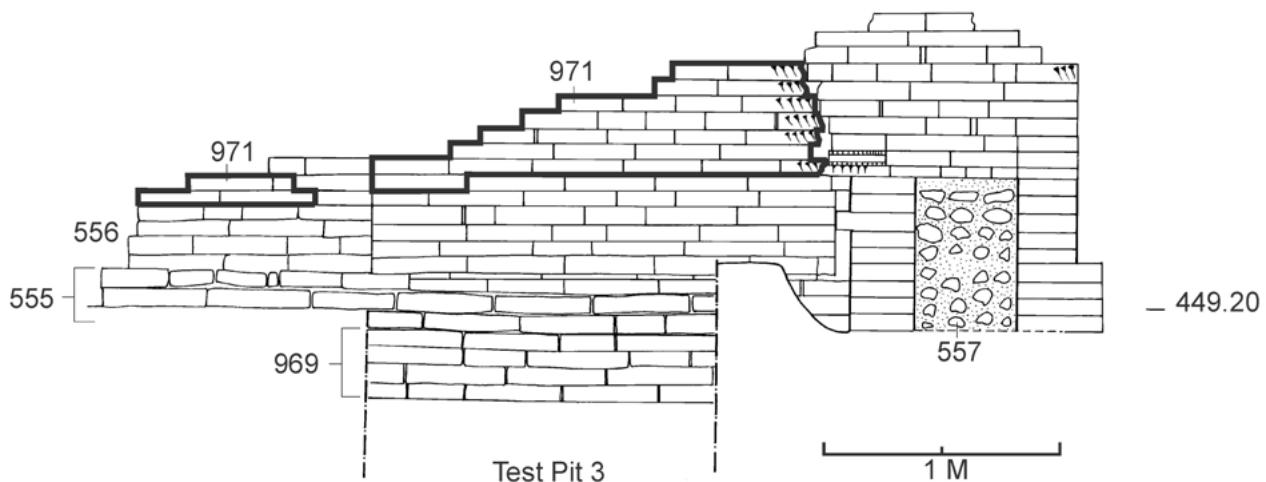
Schematic section/view of the *garbhagriha* wall of the North Temple looking north showing the extent of later rebuild 971.
